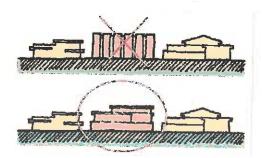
In the lower example the middle building fits better with its architectural context by use of horizontal articulation
